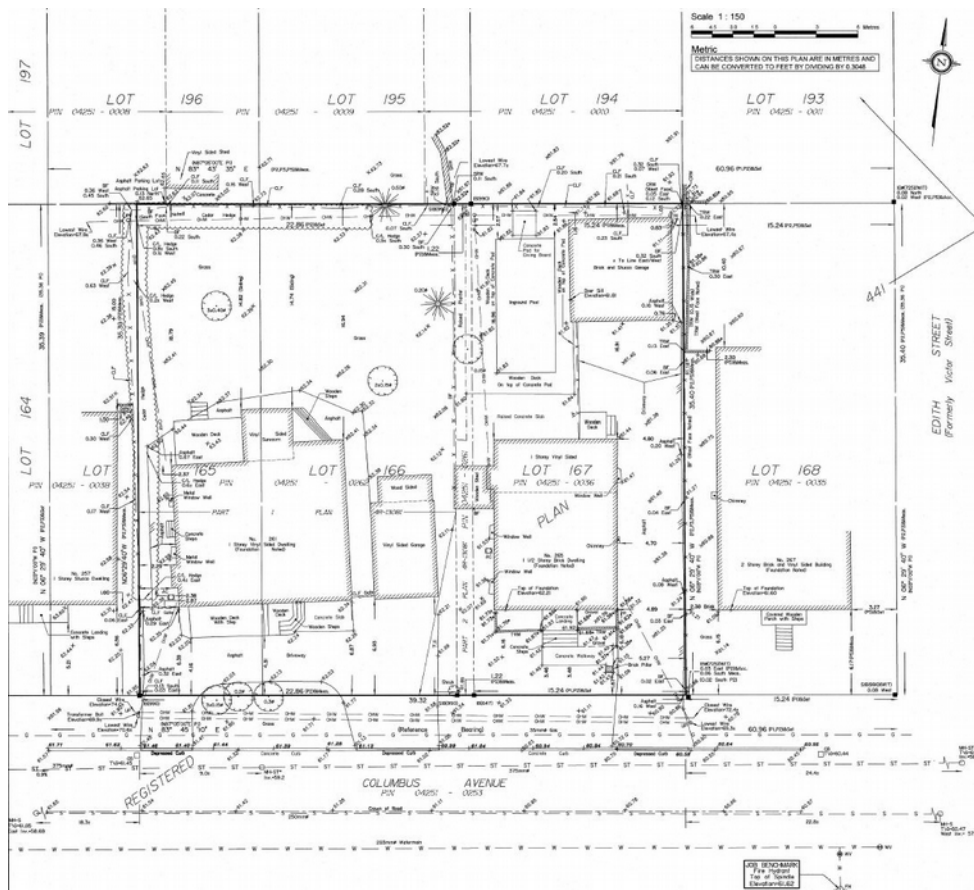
261 & 265 Columbus Avenue Site Survey.
